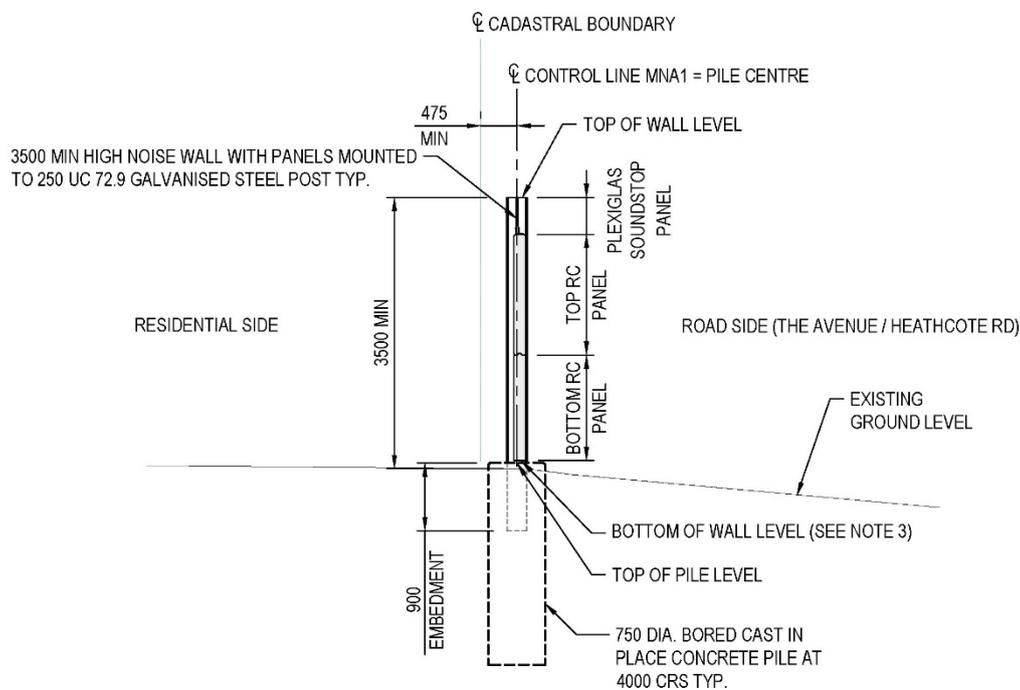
Proposed noise wall changes – NCA D – typical cross section
